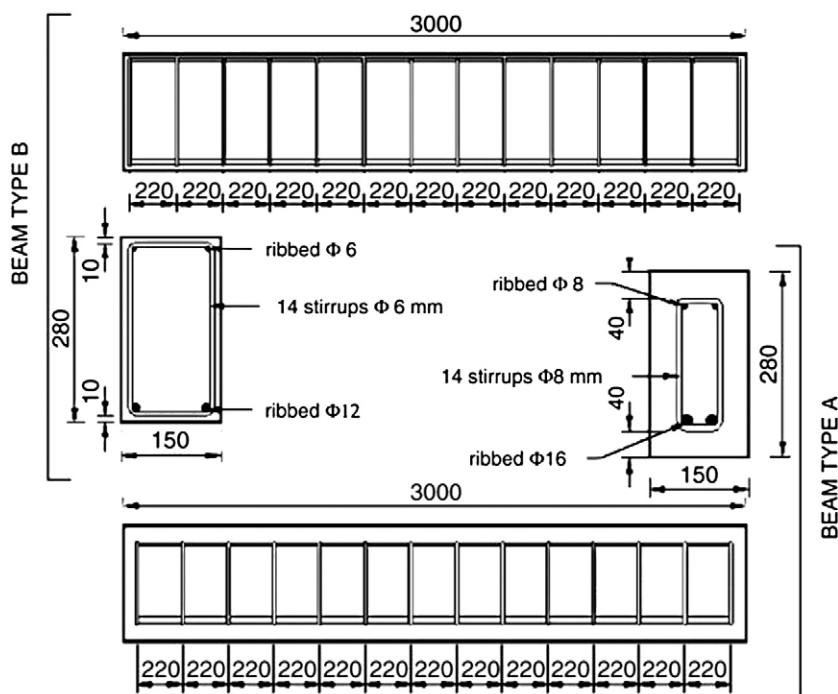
Layout of the reinforced concrete beams (all dimensions in mm).
